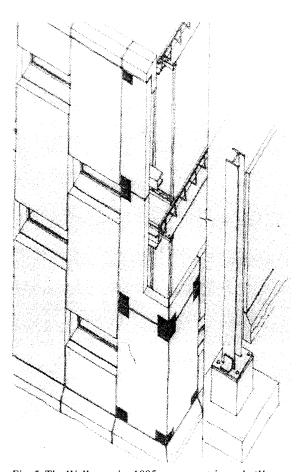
The Wall exercise 1995: axonometric study (Kemner studio section).
